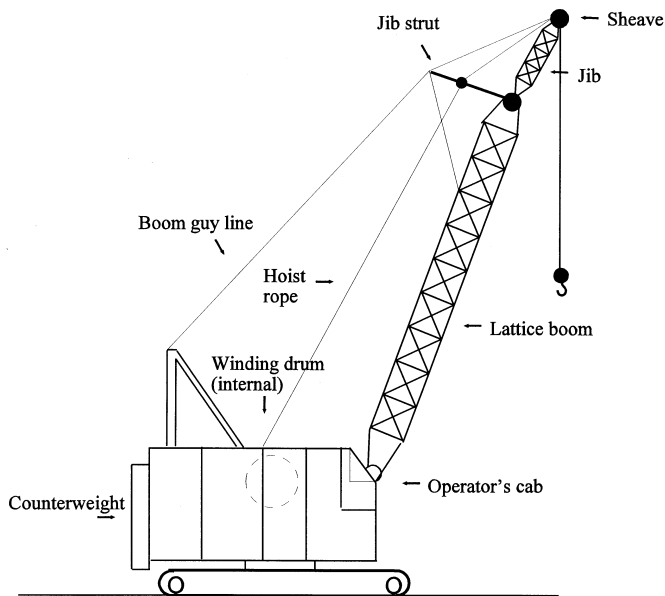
Simple illustration of a mobile crawler crane with a lattice boom.
